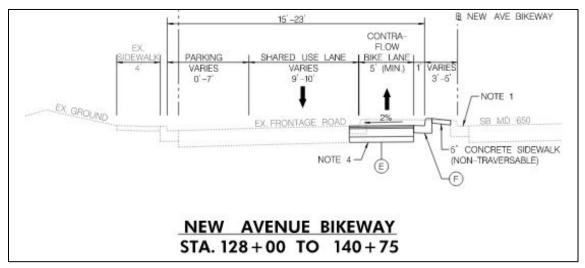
Bike Lane/Sharrow between Kingwood Drive and Sligo Creek Parkway – Proposed Cross Section
